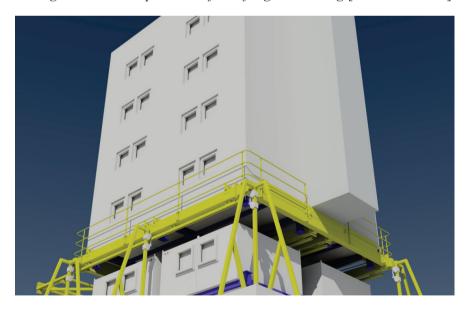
Assembly of last floor [Routine 2: R2.I]
